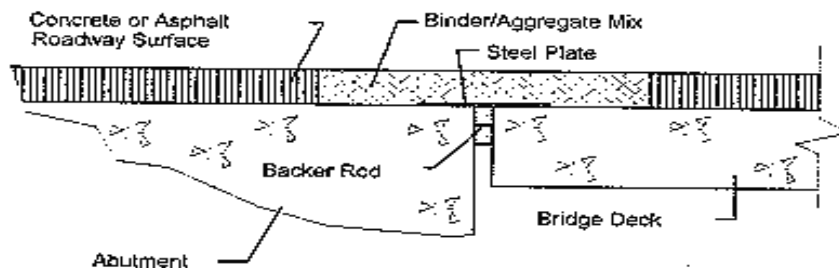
Typical Asphalt Plug Joint Cross Section.
